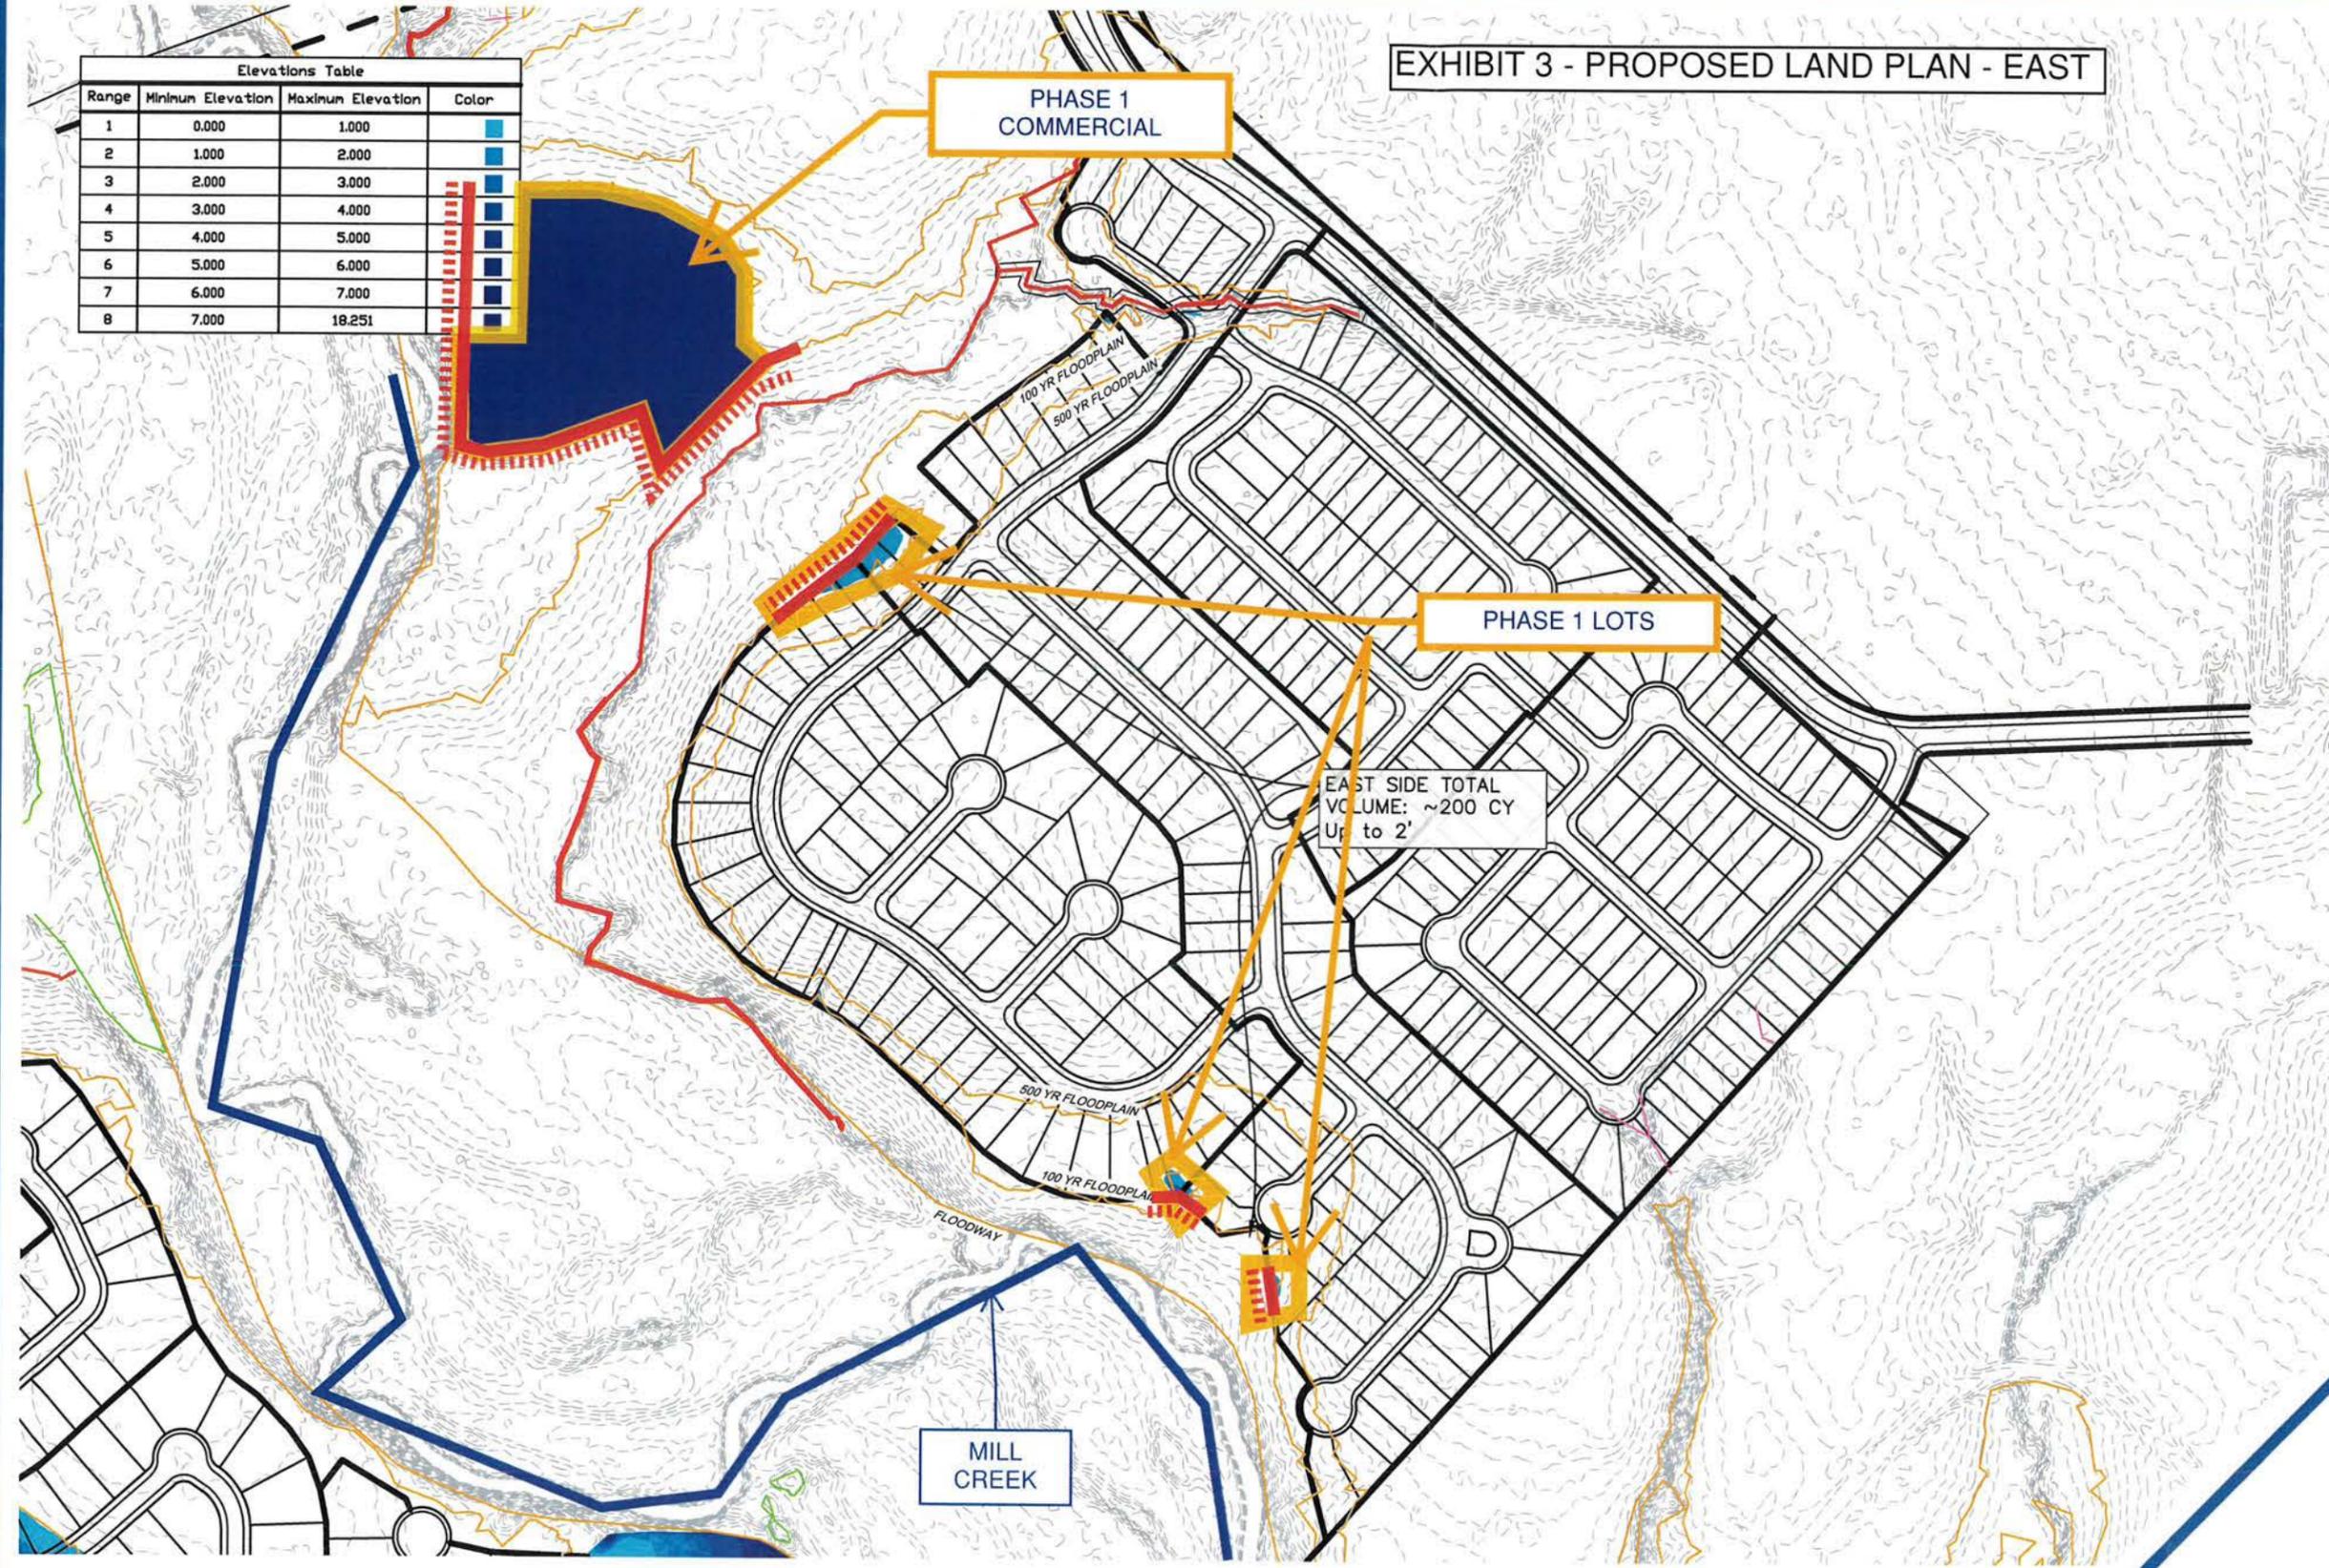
PROPOSED LAND PLAN - EAST
